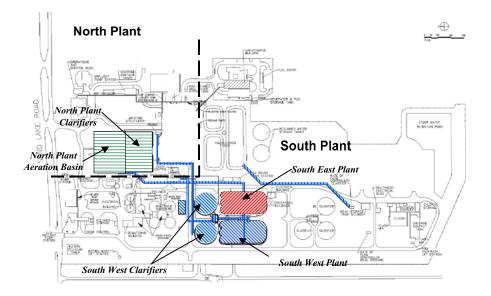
South Water Reclamation Facility Phase IV-A improvements: overall site plan
